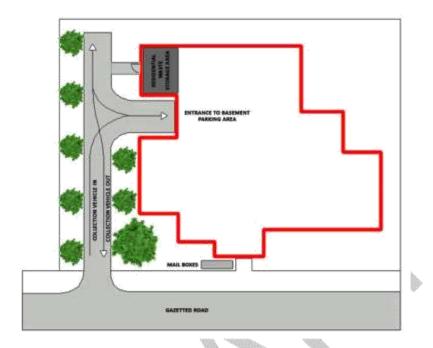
Example of an on-site (off-street) Waste Collection Arms
